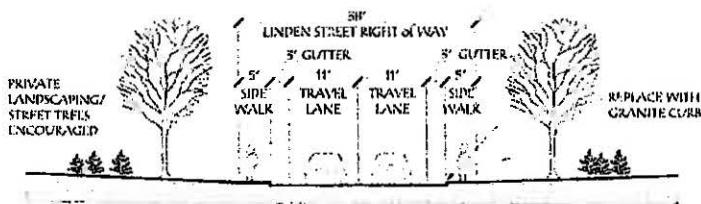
A: Linden Street Corridor Improvement Plan - Kingsbury Street to Everett Street
